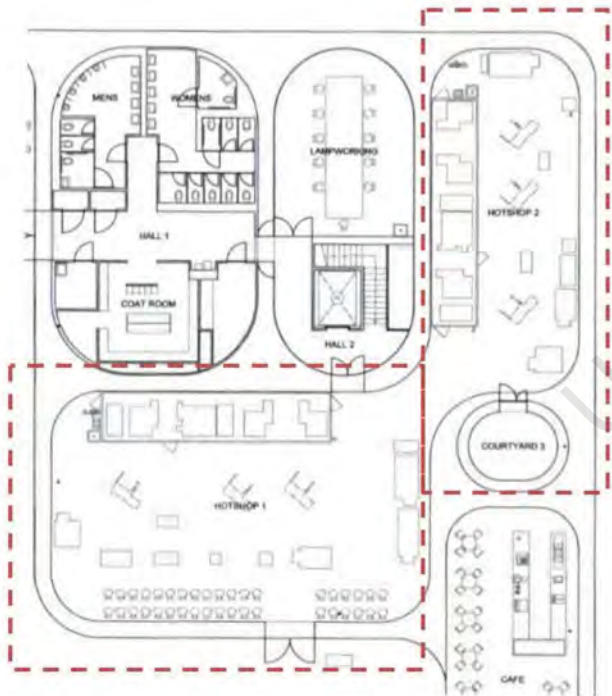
Toledo Glass Pavilion plan showing Hot Shop zone [Detail, 2007]
